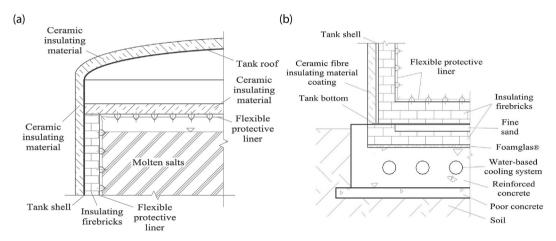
A cross-section for the molten salts storage tank where:(a) roof & (b) construction base [67].
